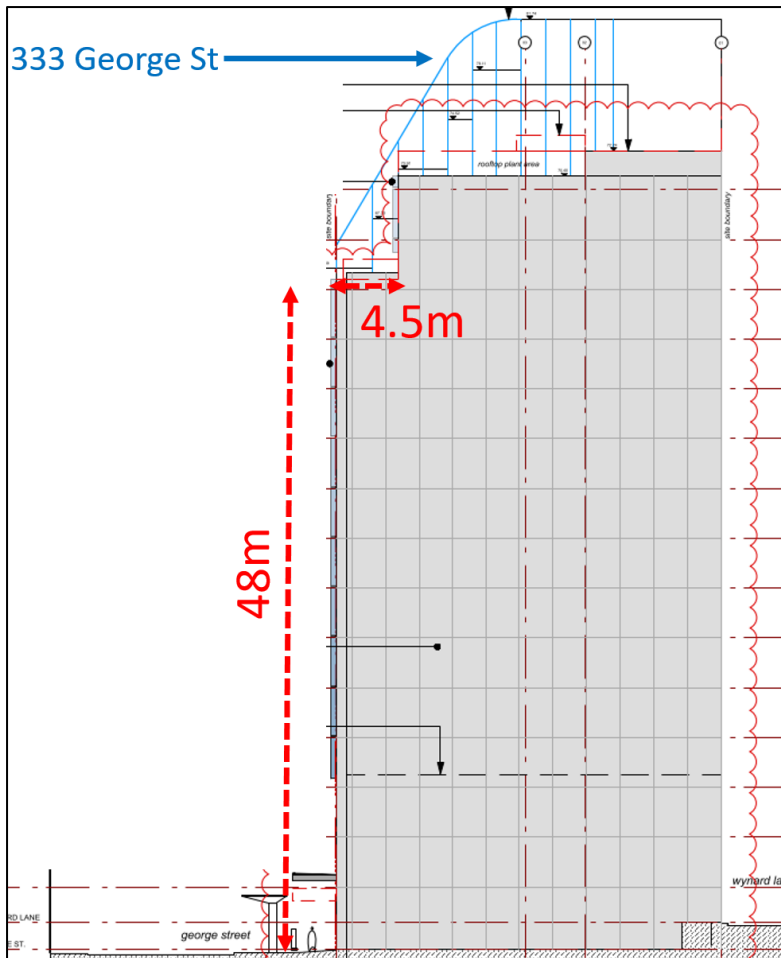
Proposed north (side) elevation with the street frontage height and setback indicated in red. The street frontage height and curved/tapered front setback of 333 George Street in shown in blue.
